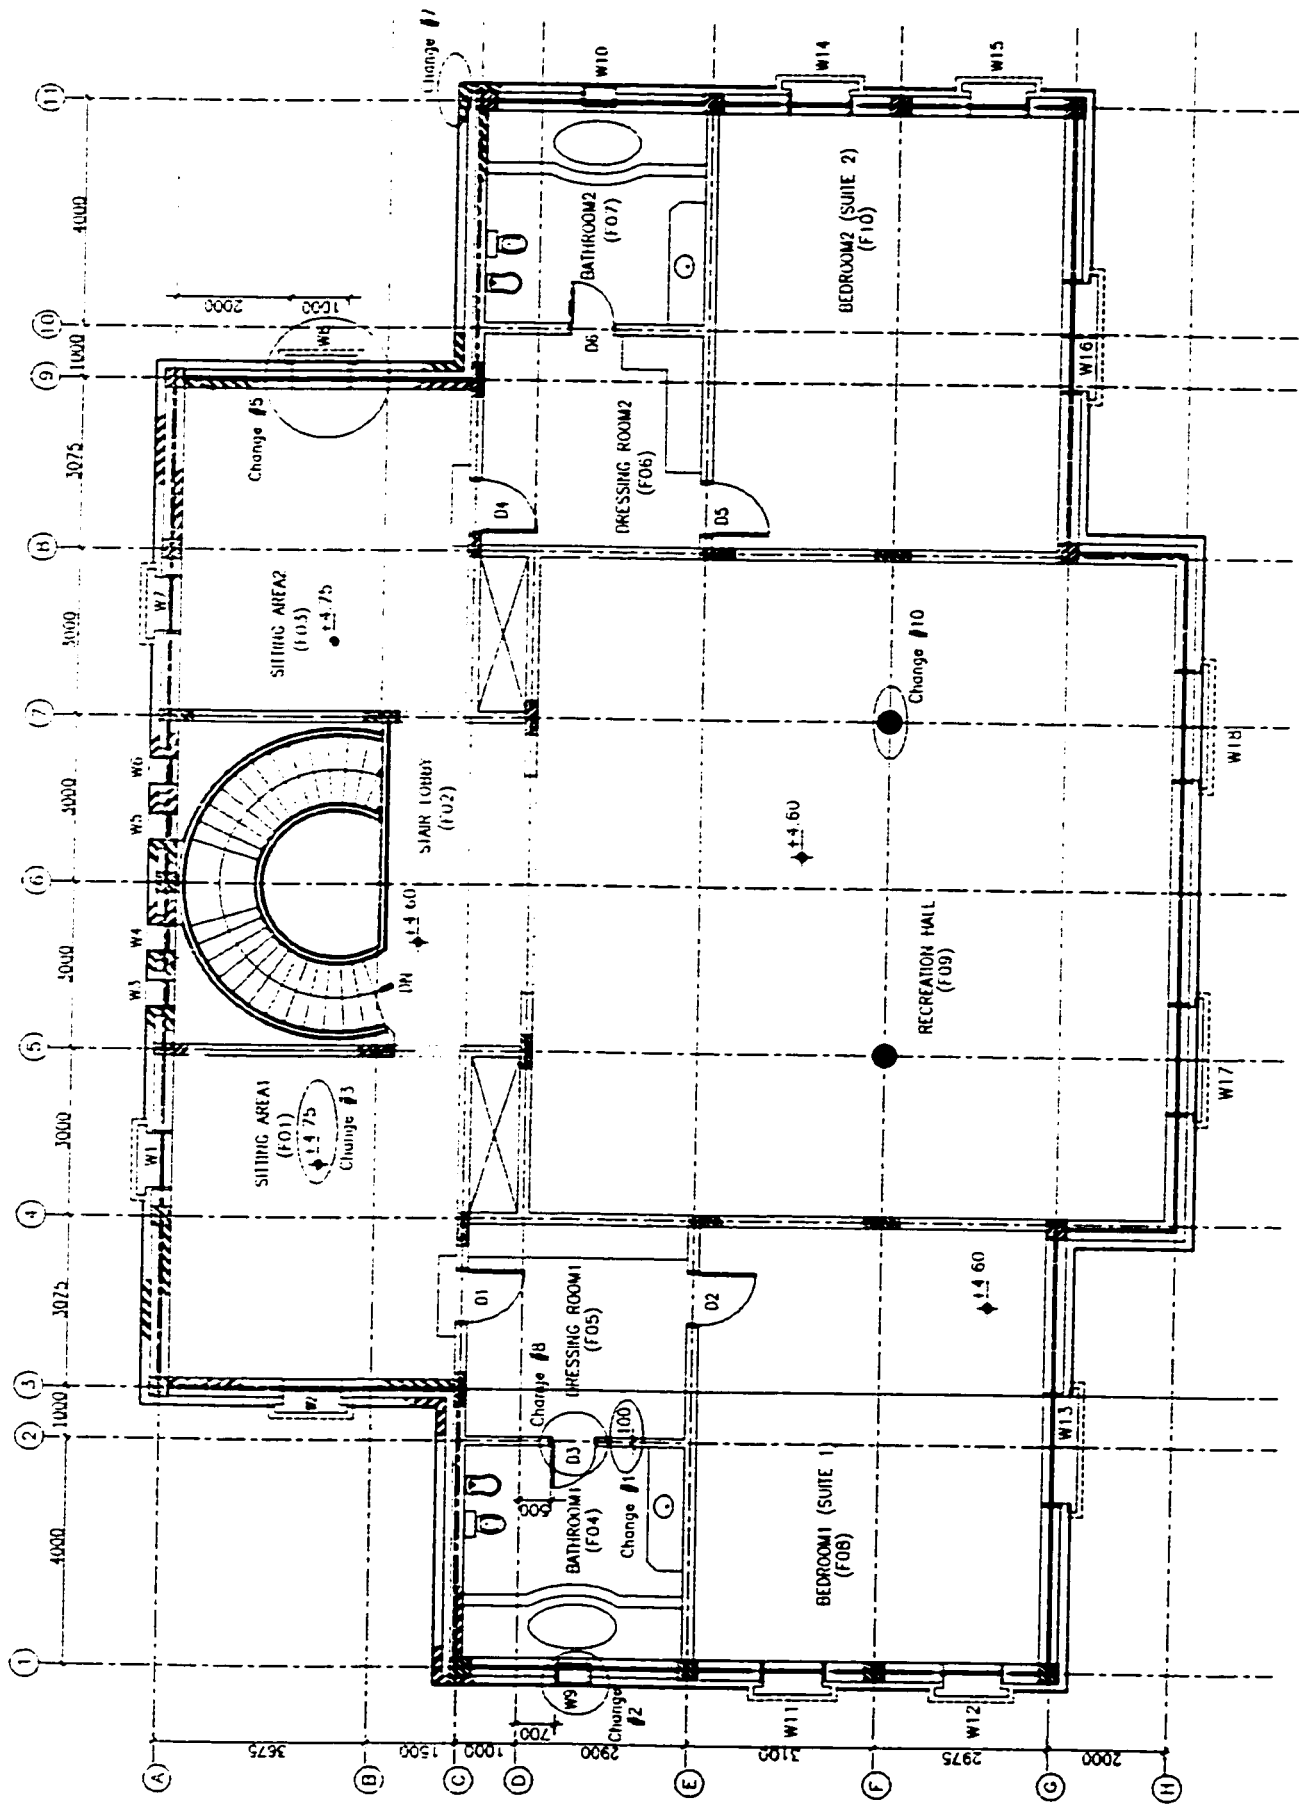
First Floor Architectural Plan of the Case Study Building.
